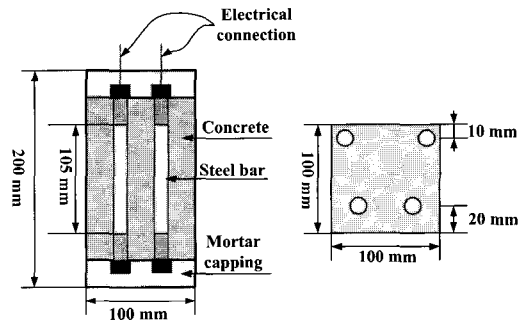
Schema of steel rebar corrosion specimen
